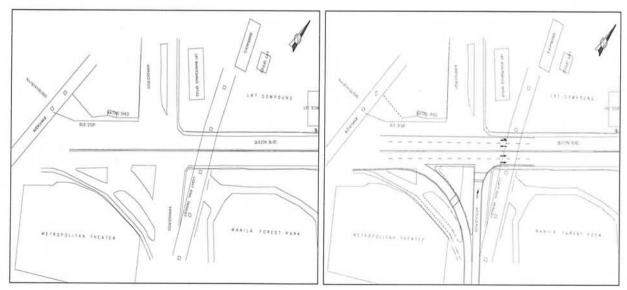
Existing Approach 1 Intersection before Improvement
